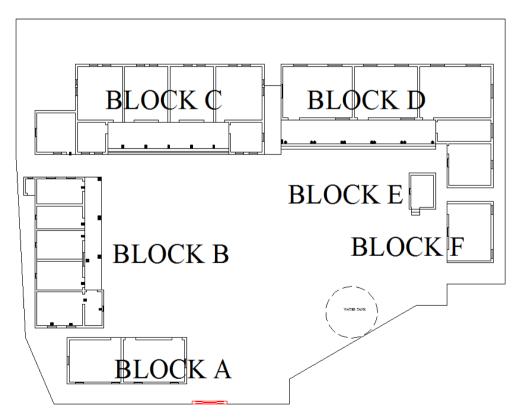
Layout of the school building at Dobhalwala in Dehradun city.
